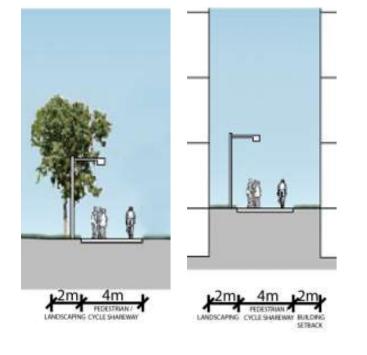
Pedestrian Ways - Typical Section (Source: Ryde DCP 2014)
